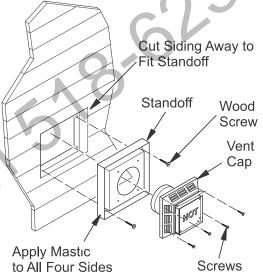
Installing Siding Standoff (Combustible Exterior Wall)
